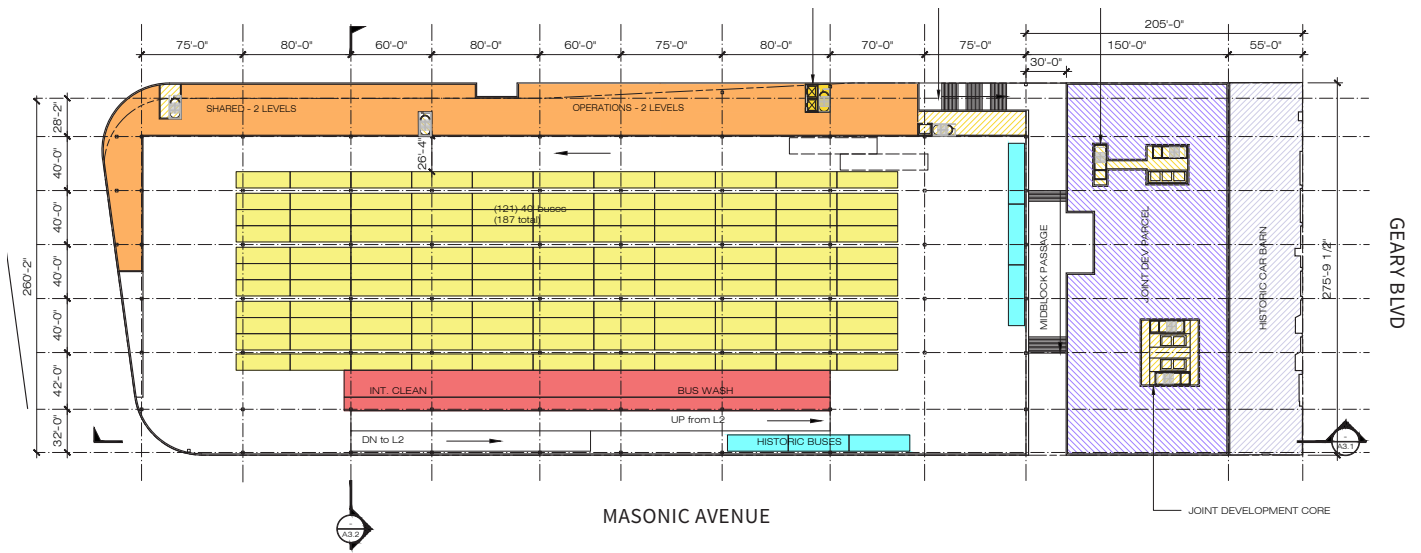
BUS FACILITY CONCEPT DESIGN - THIRD LEVEL PLAN
